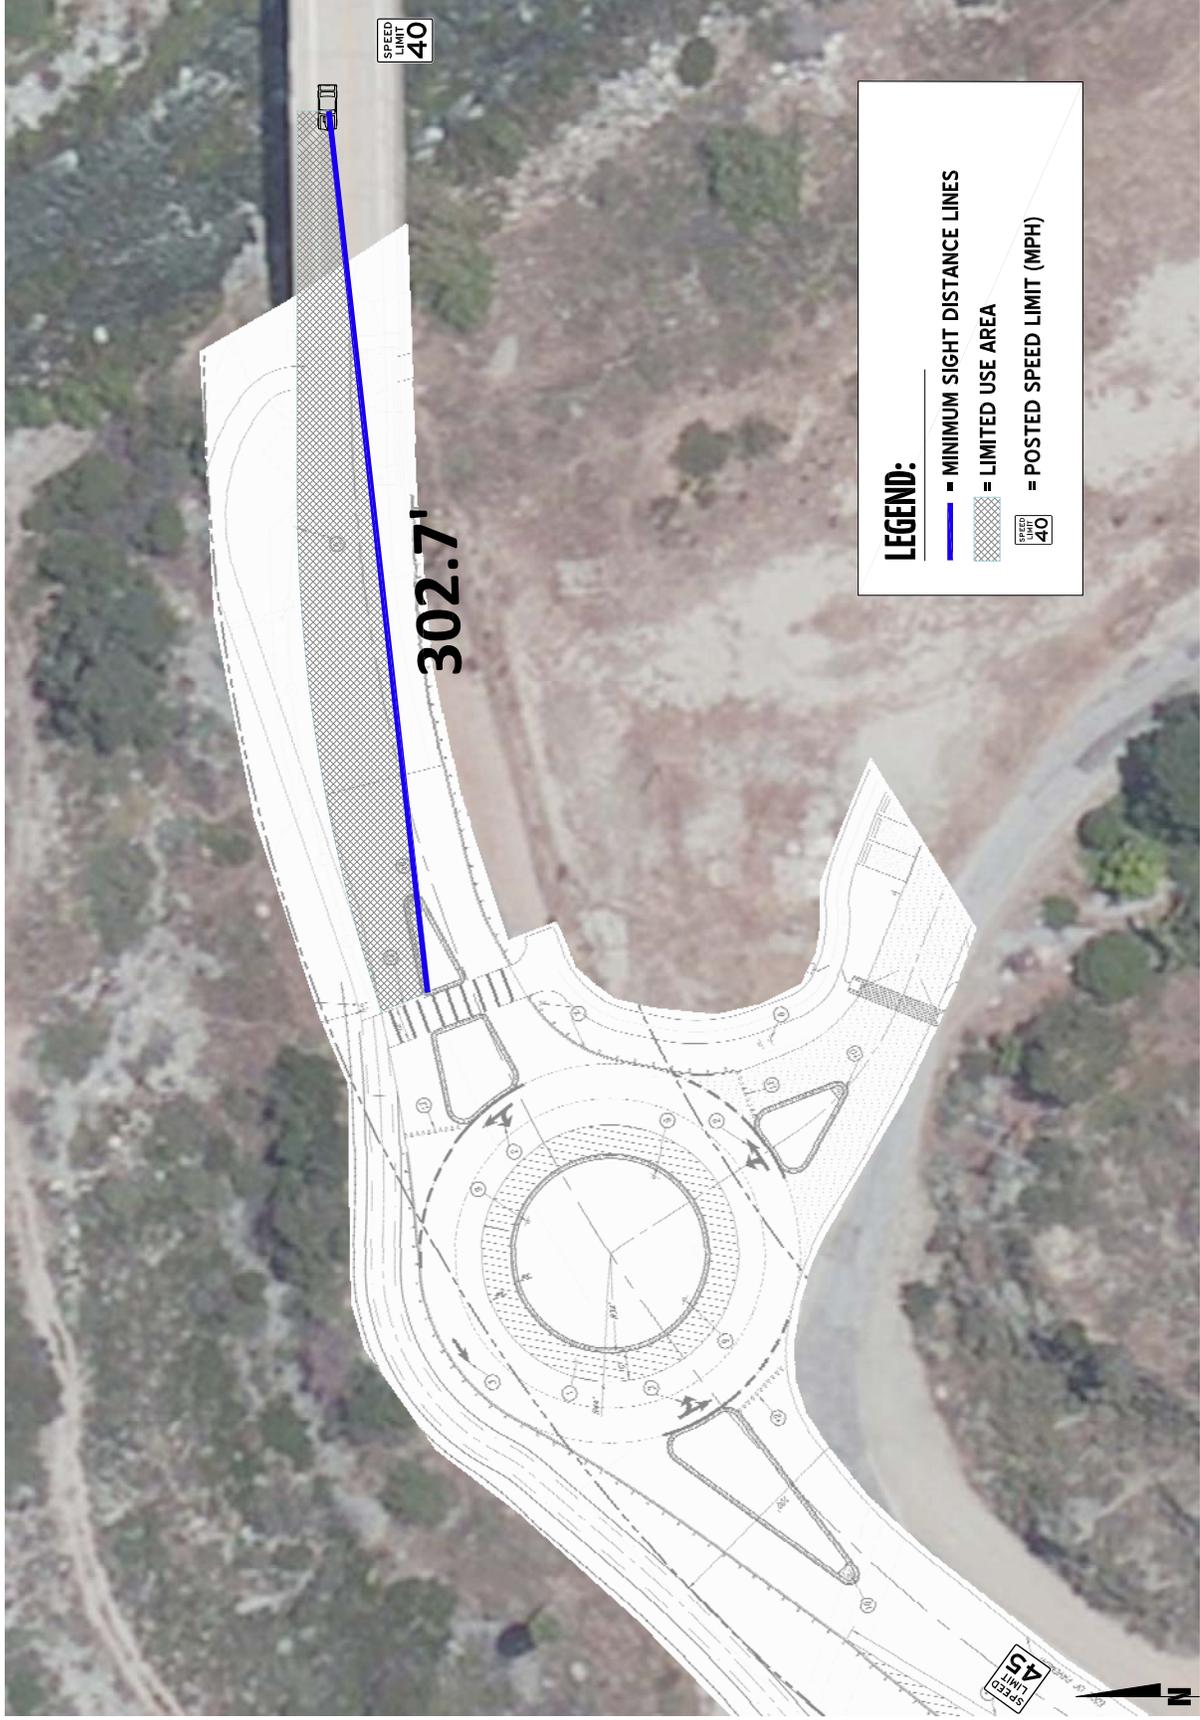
HORIZONTAL SIGHT DISTANCE AT ABC ROAD (TO TAYLOR HOUSE) AND HIGHWAY 39
